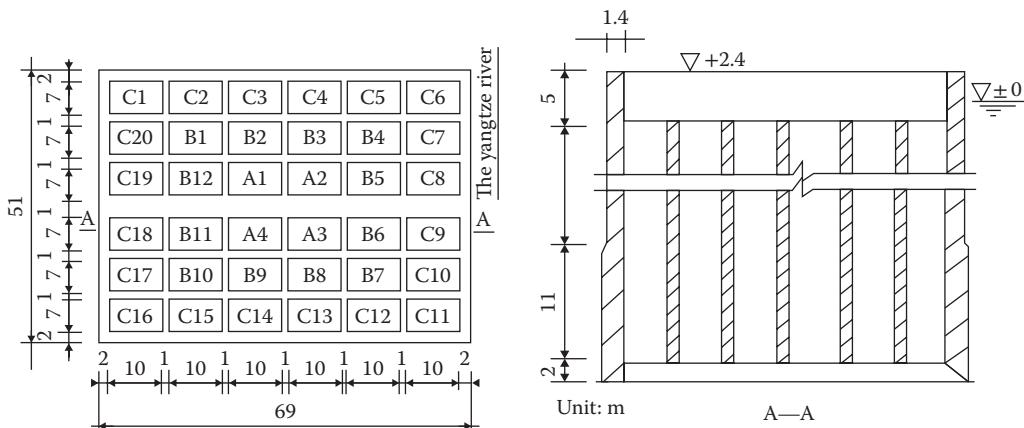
Caisson structure, Jiangyin Bridge.
